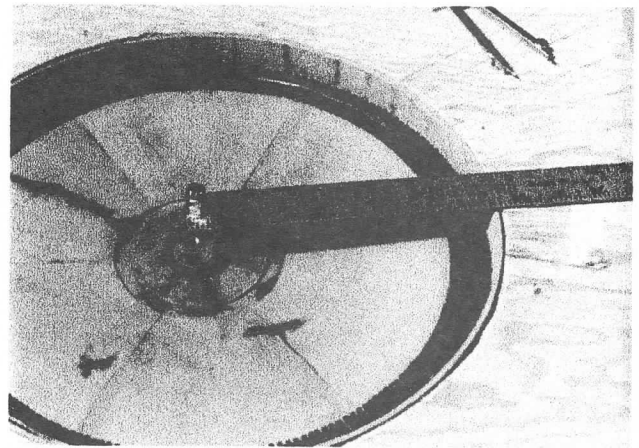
Photo A: The turntable pit with the bridge replaced by a trammel beam. The latter was used to lay out the lead tracks and roundhouse walls.
